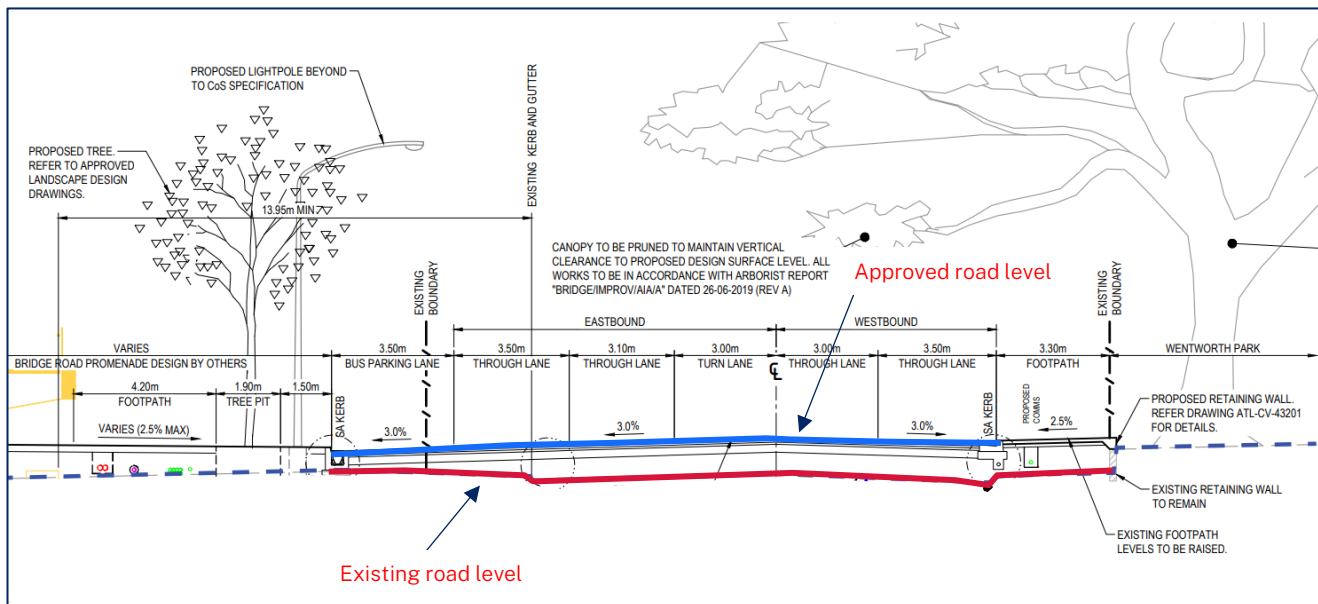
| Proposed changes to the Bridge Road levels (Source: Applicant's modification application)
